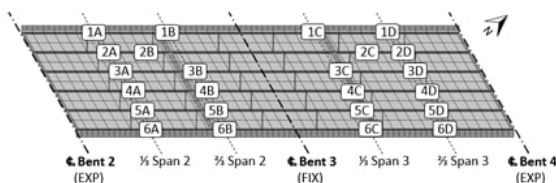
Labels for sensor groups instrumented under the bridge deck.
